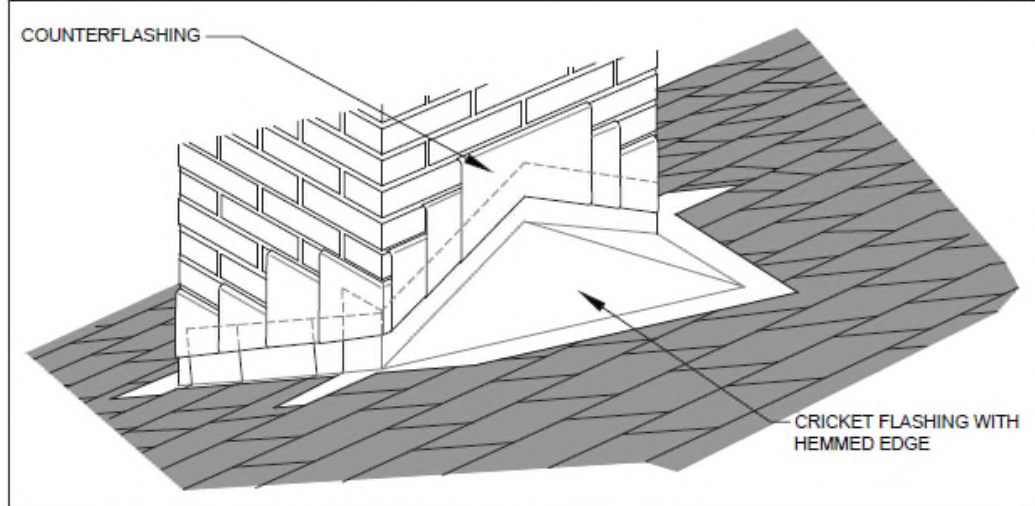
Metal cricket flashing for the upslope of a masonry chimney
